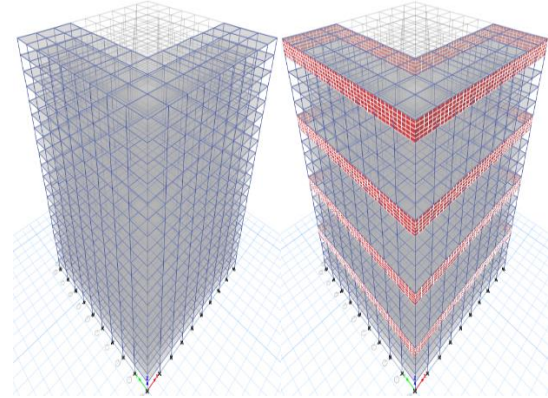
3D view structure of L - shape with bare frame and with belt wall
